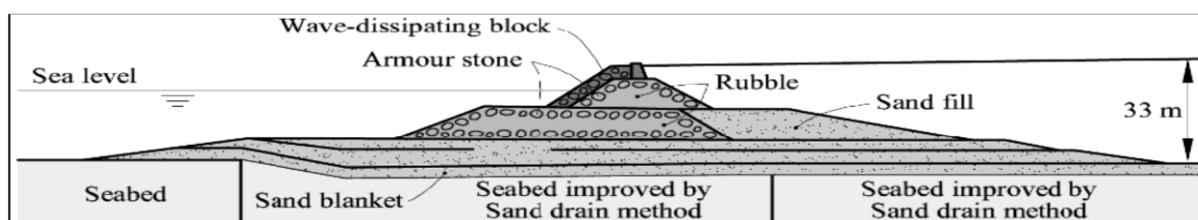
The cross-section of a seawall (Puzrin et al 2010)
